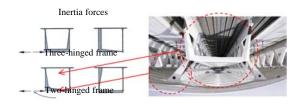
Various forms of frame designed based on stability; concrete frames which are elegant architecturally and optimum structurally
